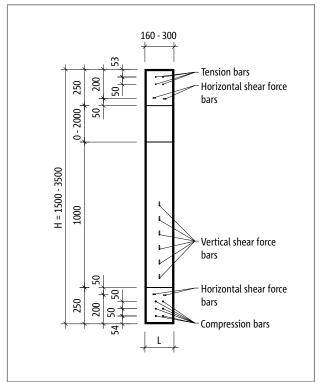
Schöck Isokorb® T type W-M1: Product section
